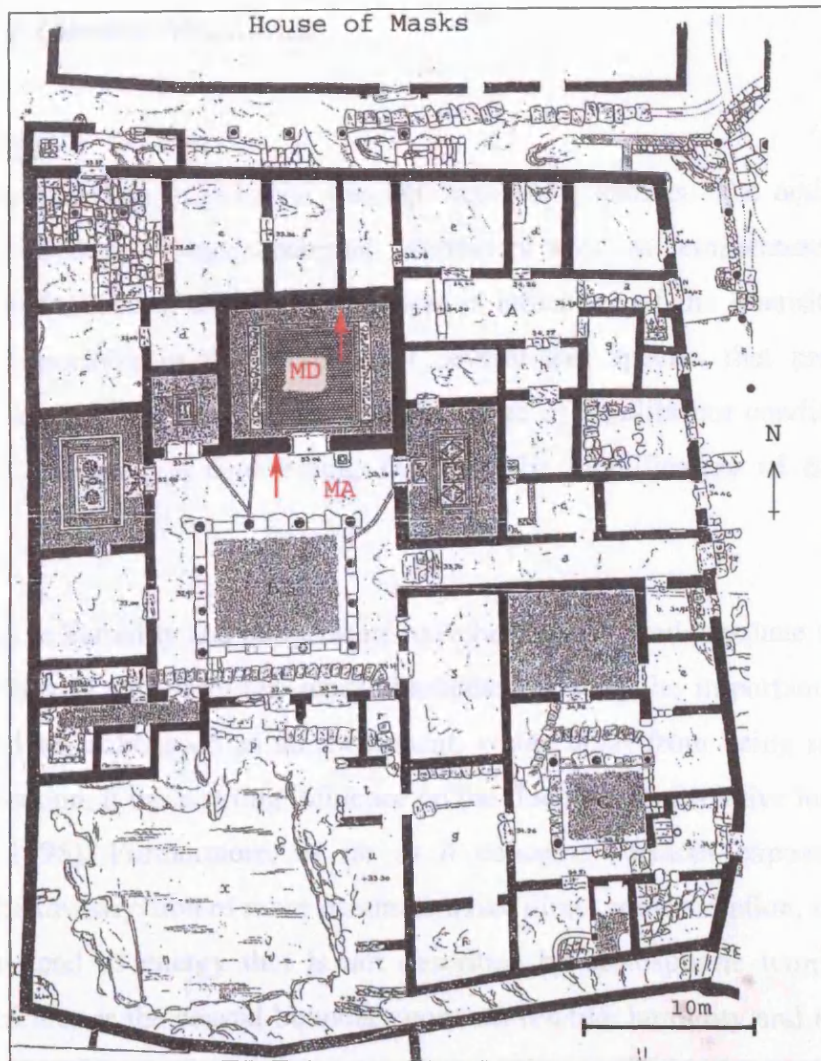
House of Masks ground plan. Red arrows mark sampling locations
